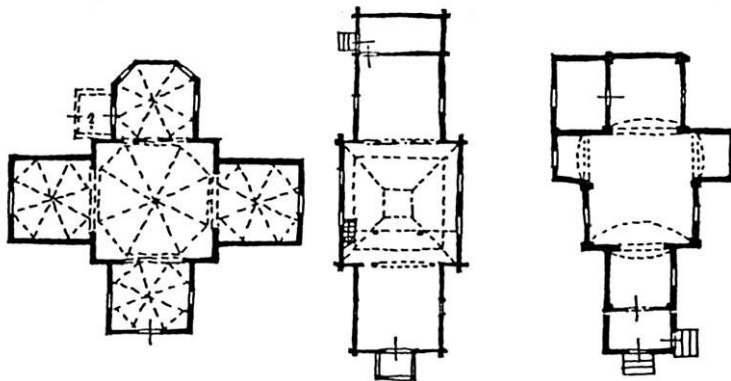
Basic forms of plans - projections of wooden Orthodox churches: Greek cross plan, longitudinal form, Latin cross plan. Source: Kurek 1997.
